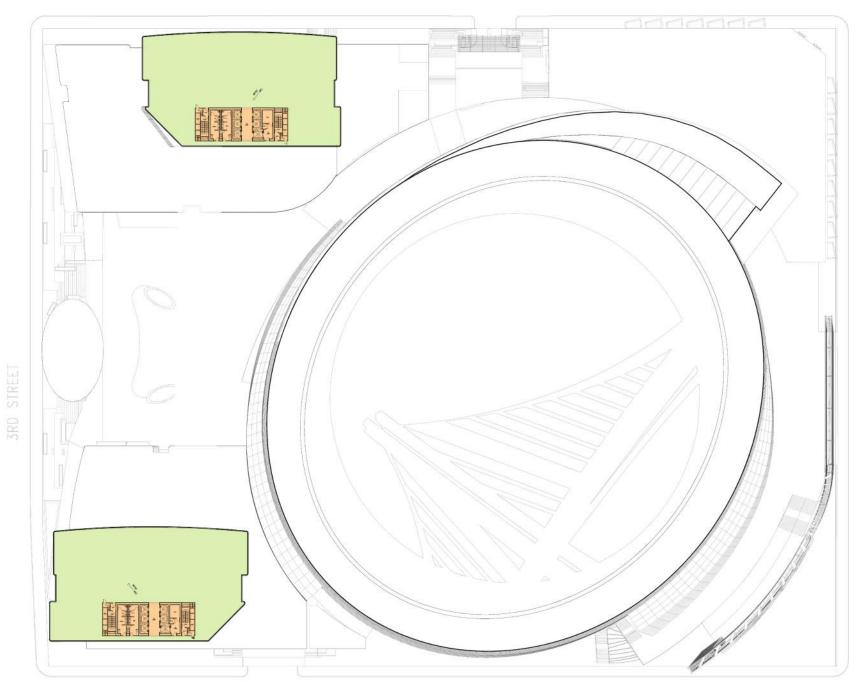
Mixed-Use Tower Roof: Maximum office/lab tower height will be +160'0" consistent with the Redevelopment Plan
